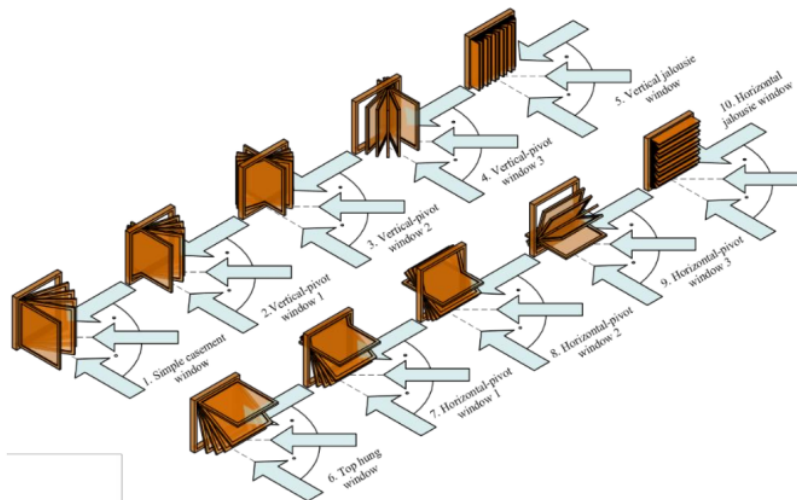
The Windows' Sash Opening Angles and Wind Directions Would be Tested
